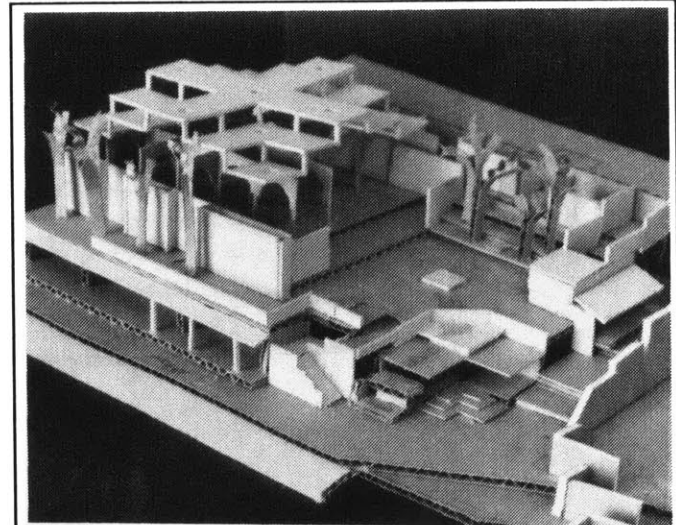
Photos of study models of the third pass. The south-east corner to the site cuts into the courtyard. Prayer hall had light timber roof with masonry bearing system.
